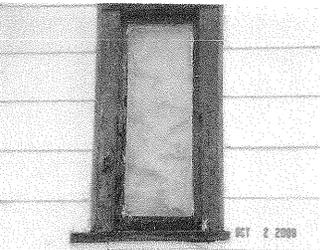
Close up of insulation visible through small window in back of church facing Hogans Alley.
